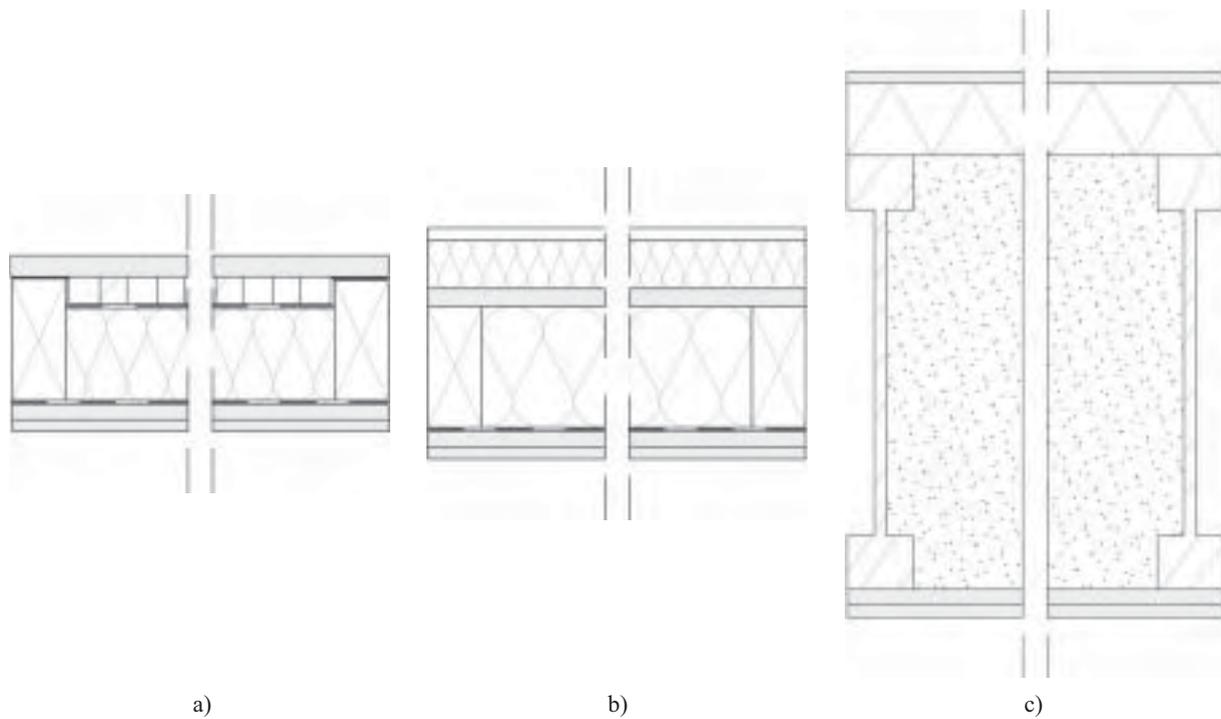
a) single-panel system (TFCL2); b) renovated single-panel system (TFCL 3), c) timber-frame wall element with I-studs (TF 3)
